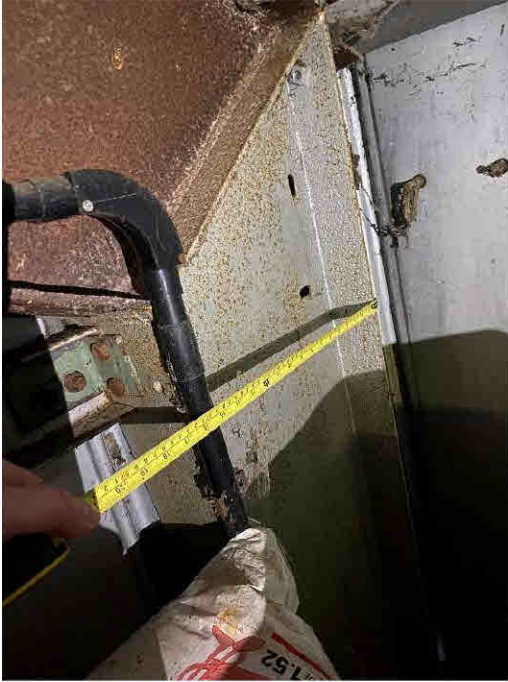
Close Up of Underside of Cover Plate Splice Connection. Rafter Width Approximately 100mm.
